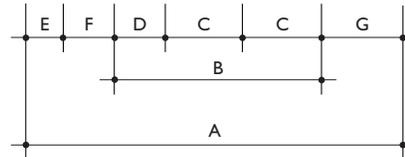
Typical 50-foot Right-of-Way Neighborhood Street section with swale
